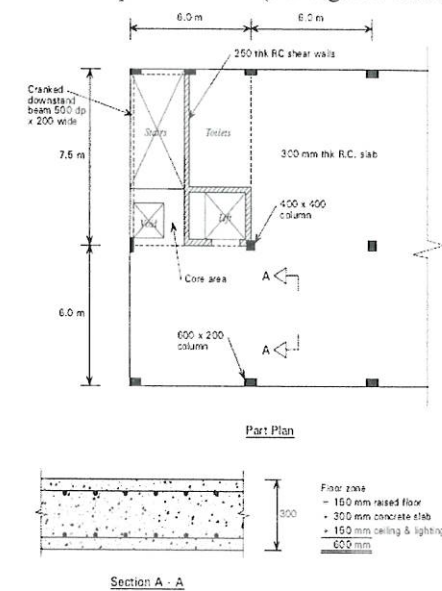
Reinforced concrete flat slab; 'concrete option' (Adopted from: SCI, 2004).
